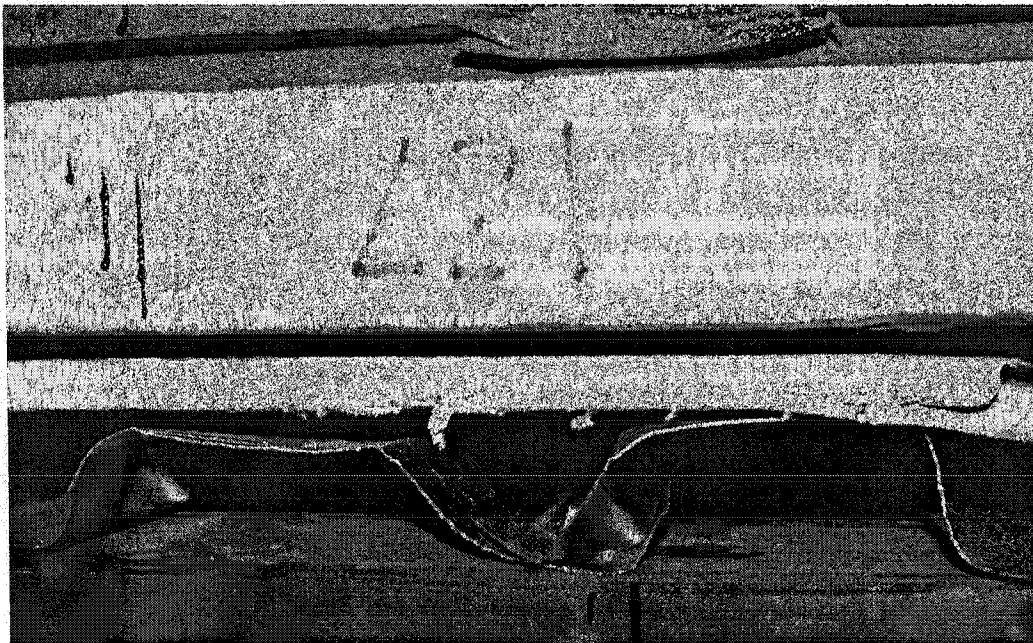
Tearing of steel sheet, and cracking of gypsum board at C21
